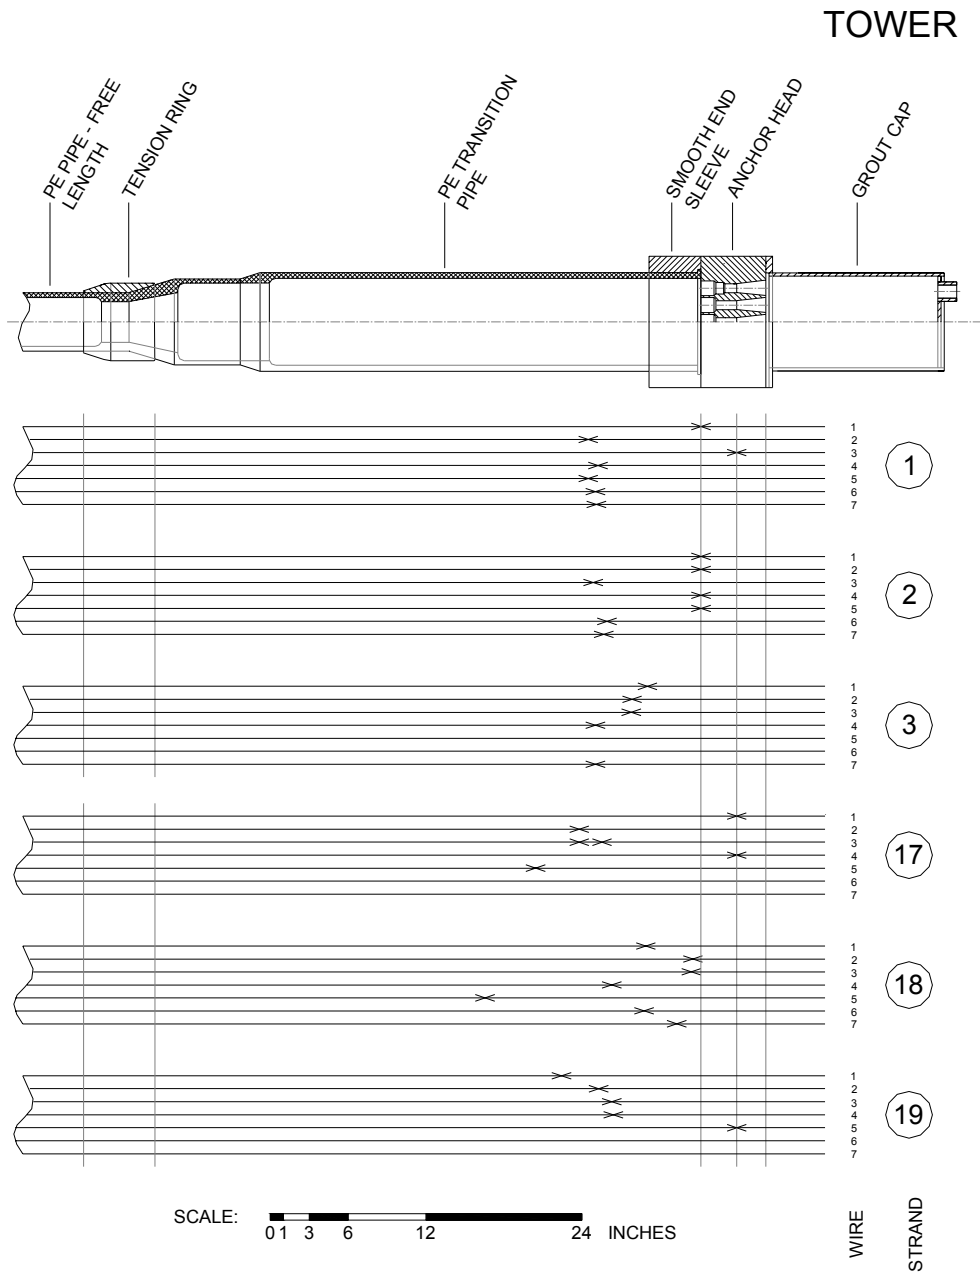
Location of wire breaks near the tower anchorage - Specimen 7
